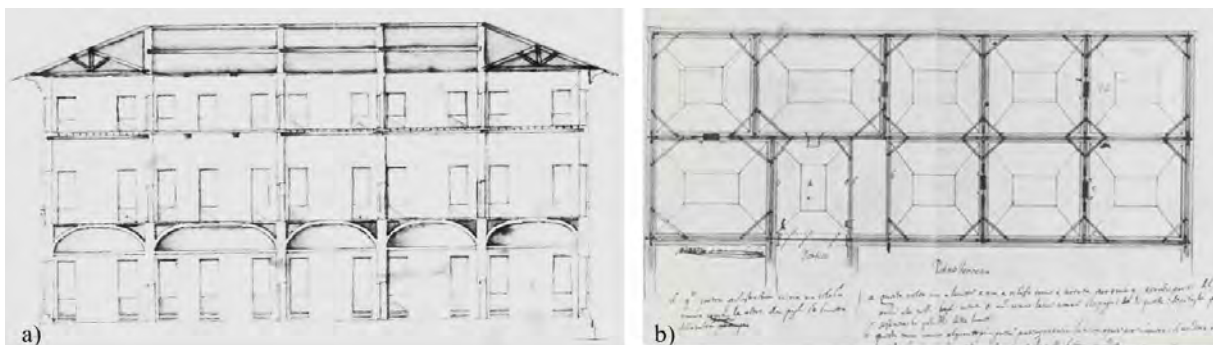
Archive documents of the executive project proposed for Volpi Palace in Como dated back approximately to 1623: a) vertical section and b) plan of the ground floor with the tie beam system arranged around the vaults and inserted into vertical walls (published in [18], pp. 20-21).
